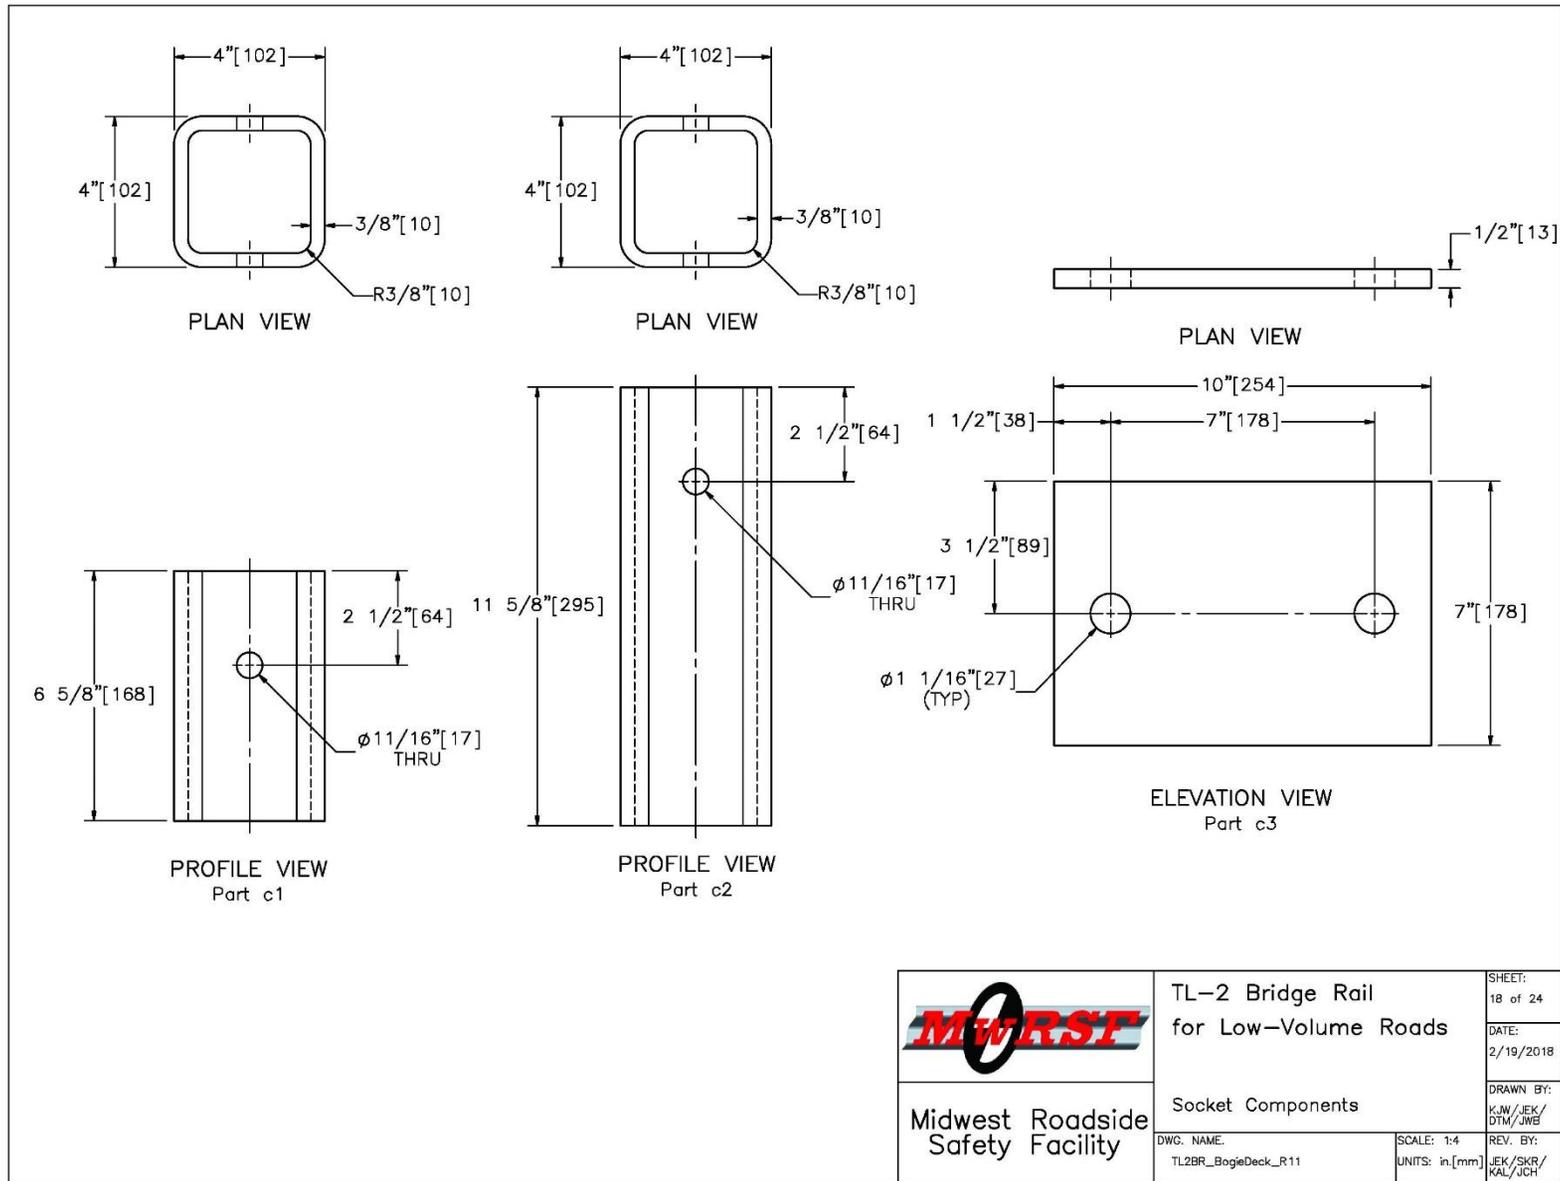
Bogie Testing Matrix and Setup, Socket Components
